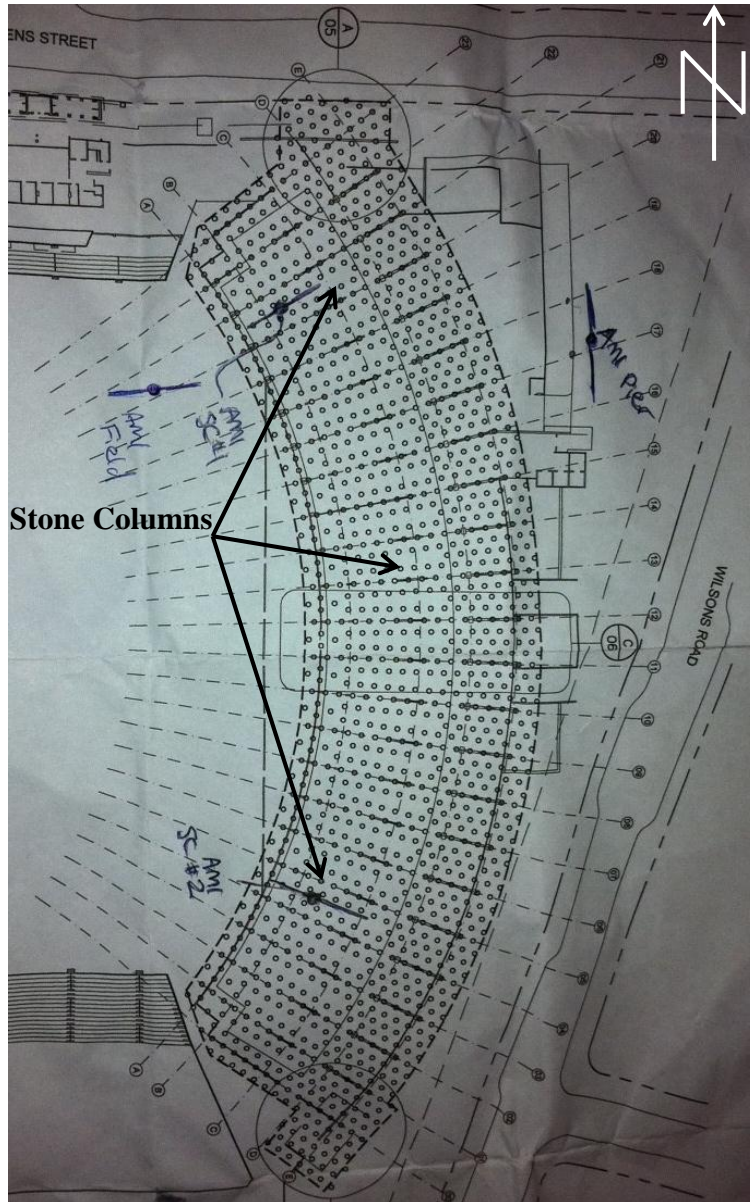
Stone column installation plan for the Deans Stand of AMI Stadium
